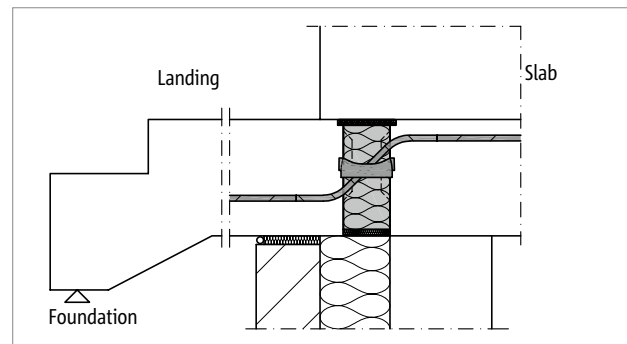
Schöck Isokorb® T type Q-E-V: Stair flight connection
